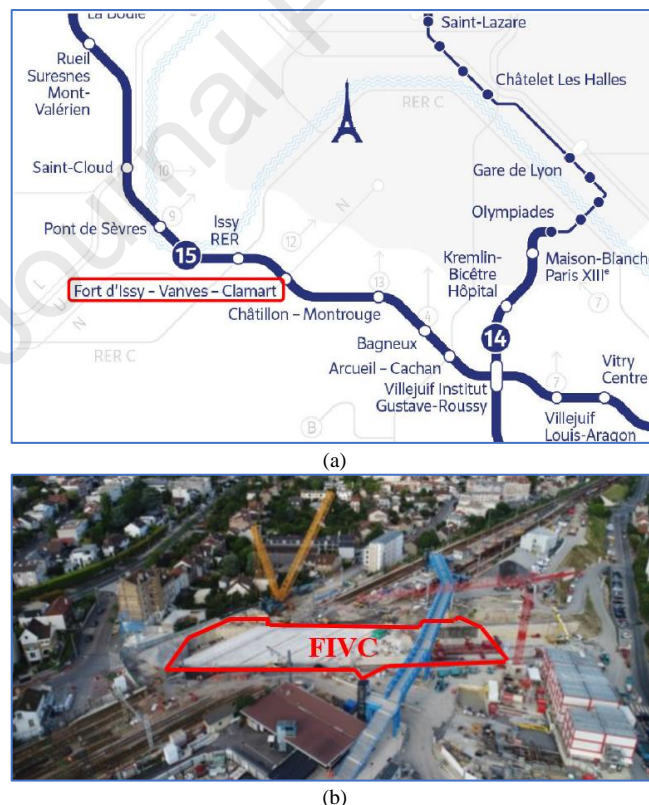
Location (a) and aerial photo (b) of the FIVC excavation.
